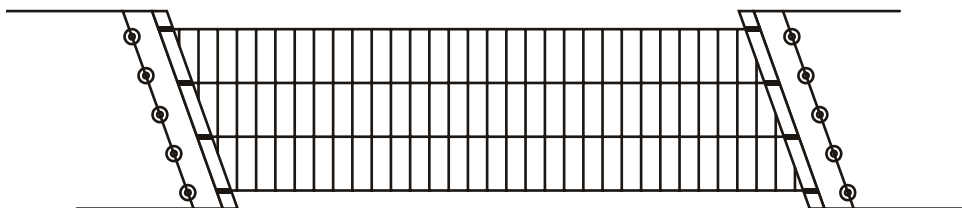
Bird view on structural model using beam elements for the superstructure
